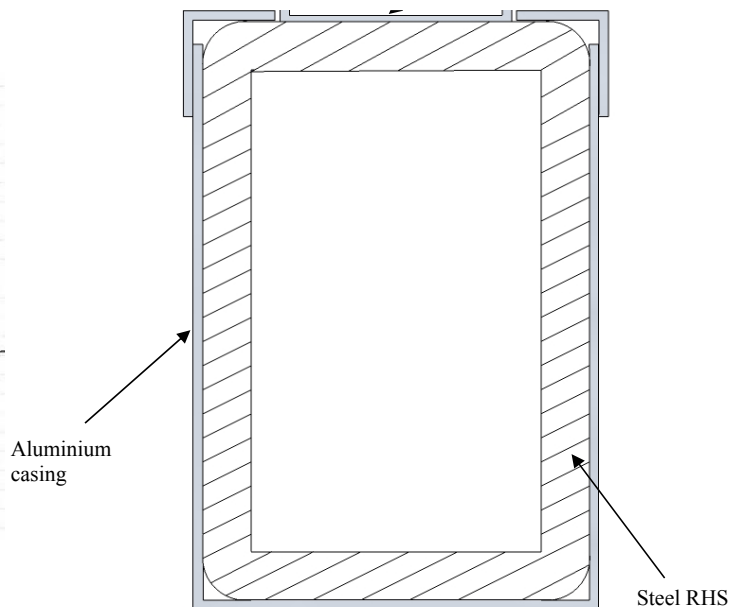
indicative sketch of aluminium casing on steel box section.
